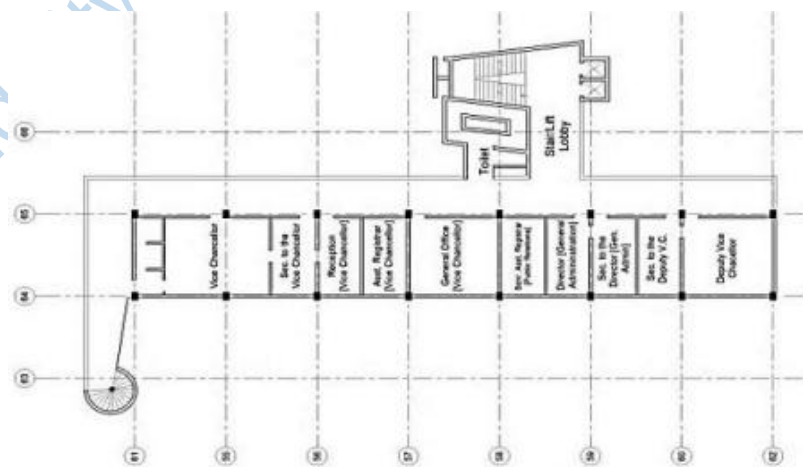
Fourth floor plan of OAU Senate Building (Source Author's Field work)
